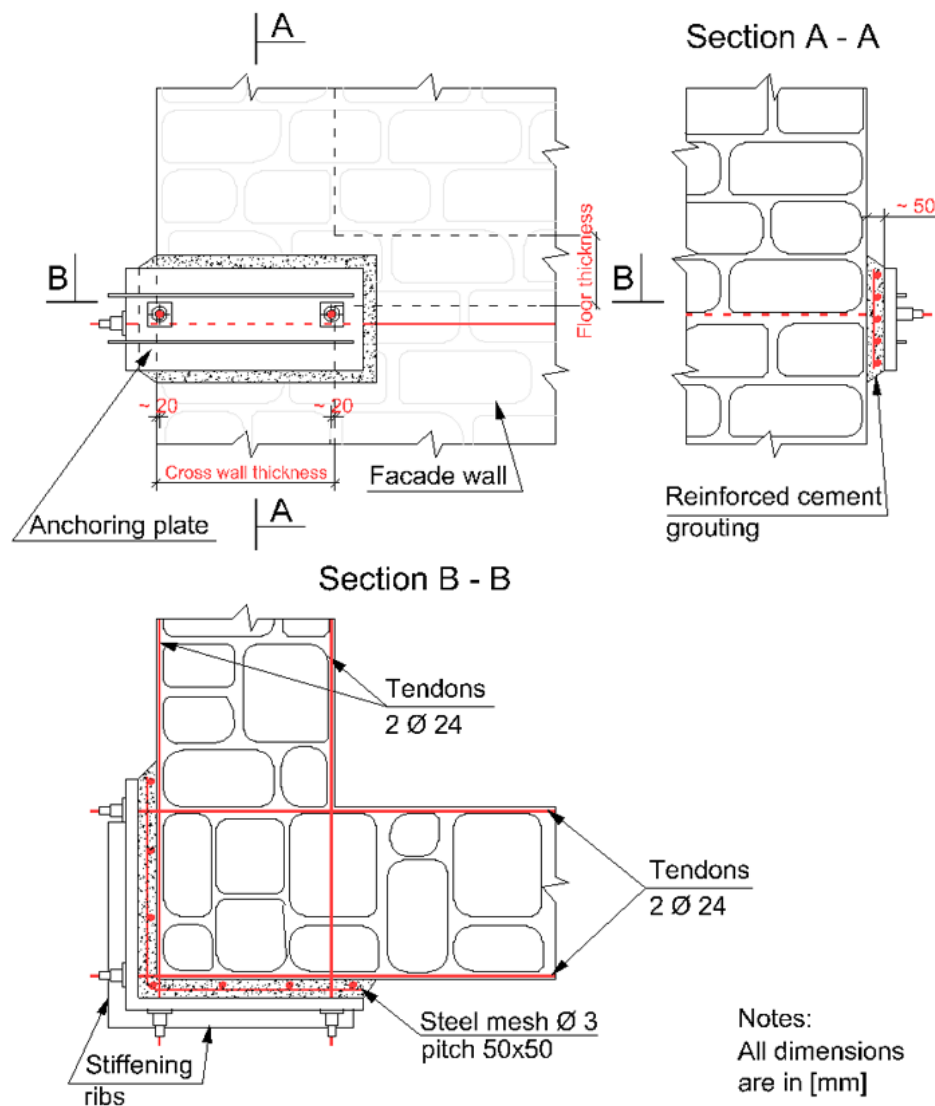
Detail of anchoring of wall steel ties at a corner [46]
